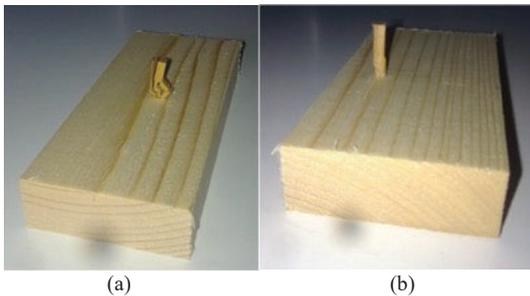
Typical damages to the wooden nail occurring during insertion; (a) splitting of the nail, (b) collapse of the wood fibre due to excessive compression stress.
